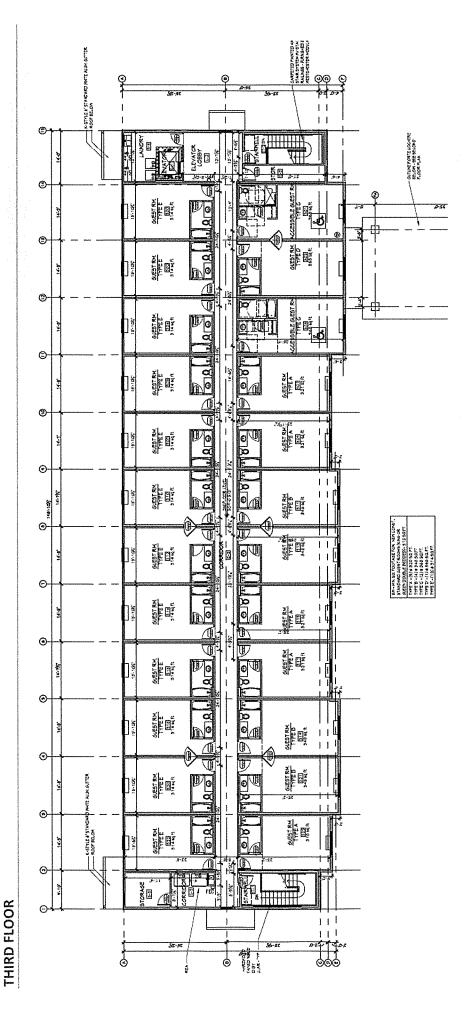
CONSTRUCTION AND FACILITIES SUMMARY
